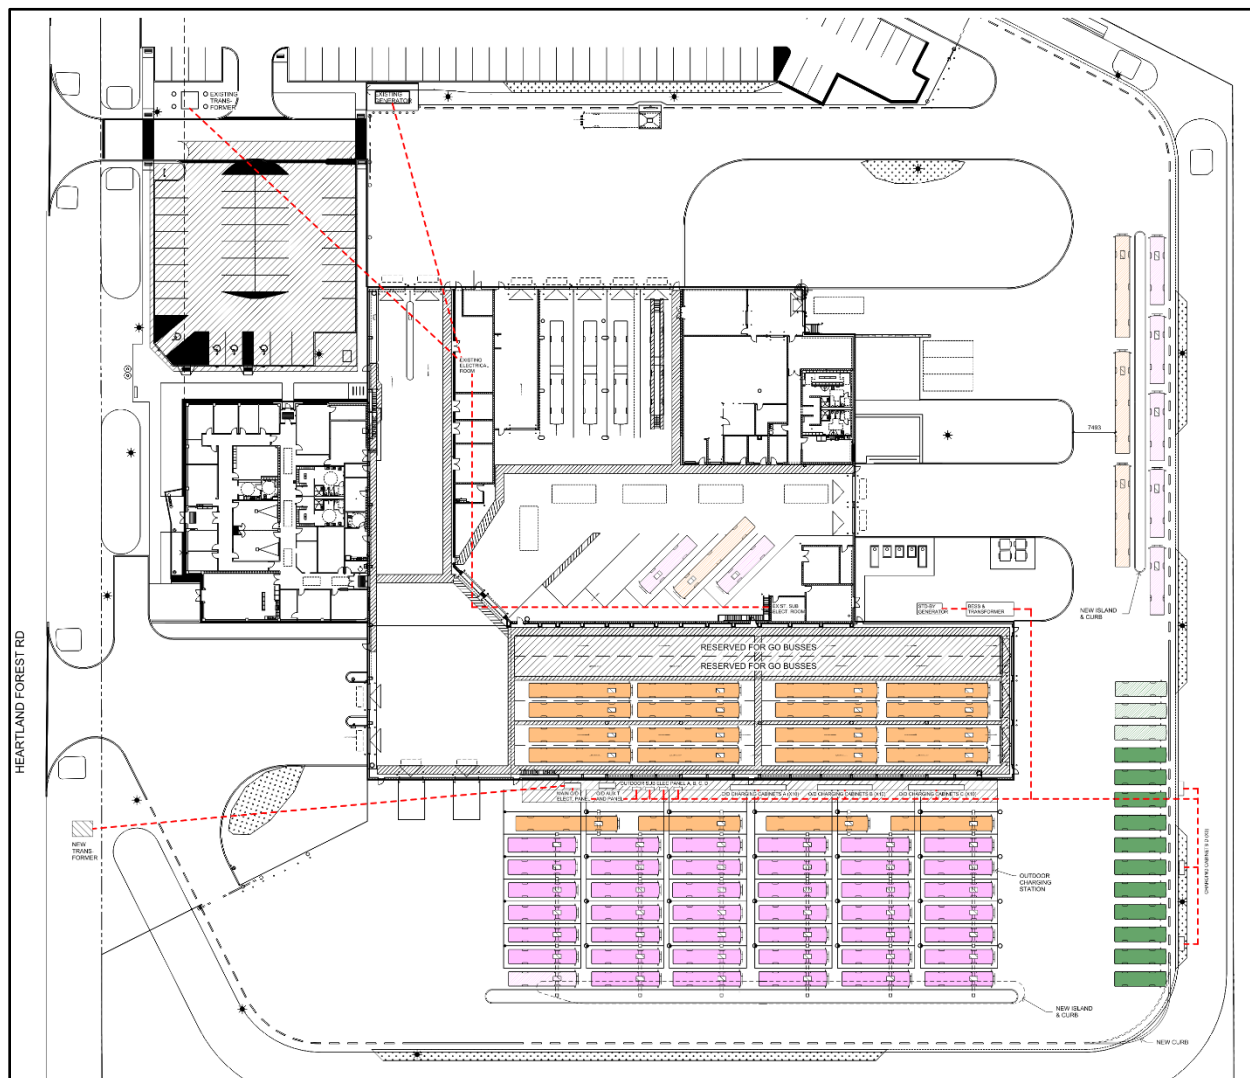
Niagara Facility Site Plan (Conceptual Only).
